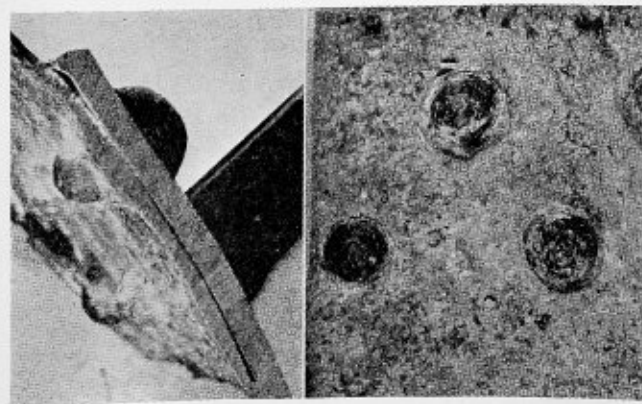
(Right) Side view of a seam section. Fig. 3.—(Left) View looking down on plate from inside
